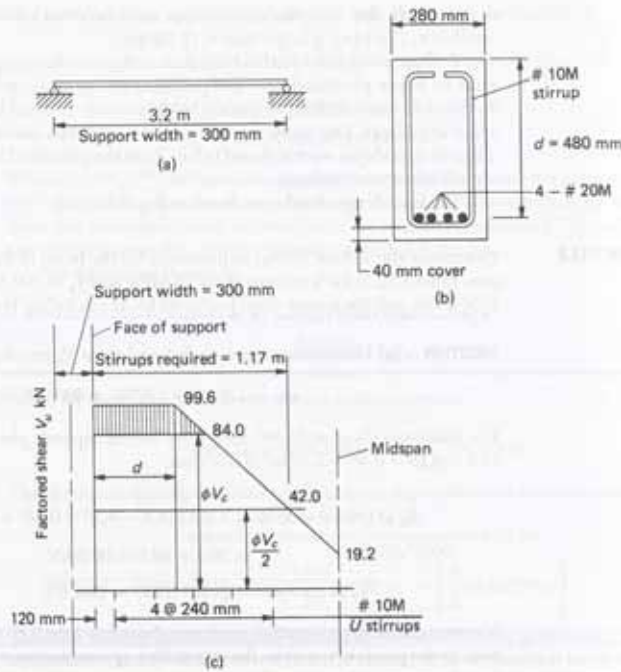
Beam and stirrup design for Example 5.12.3.
